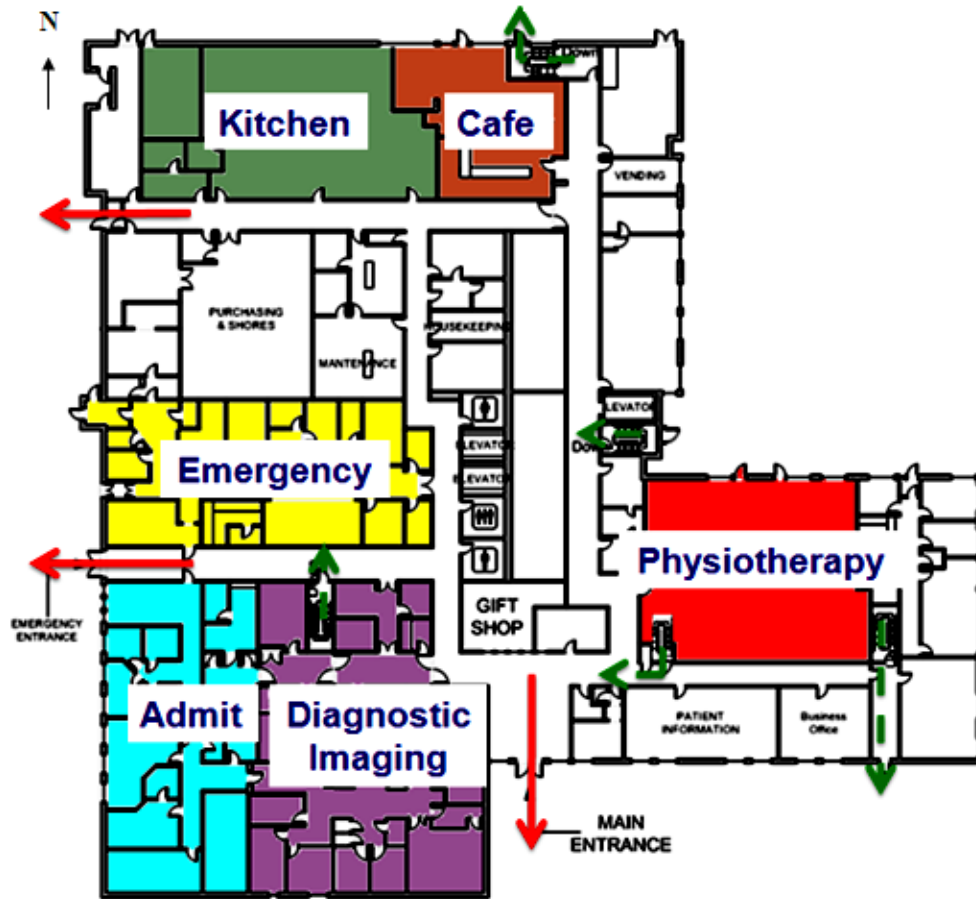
Hospital floor plan – Ground floor (Floor 1)
